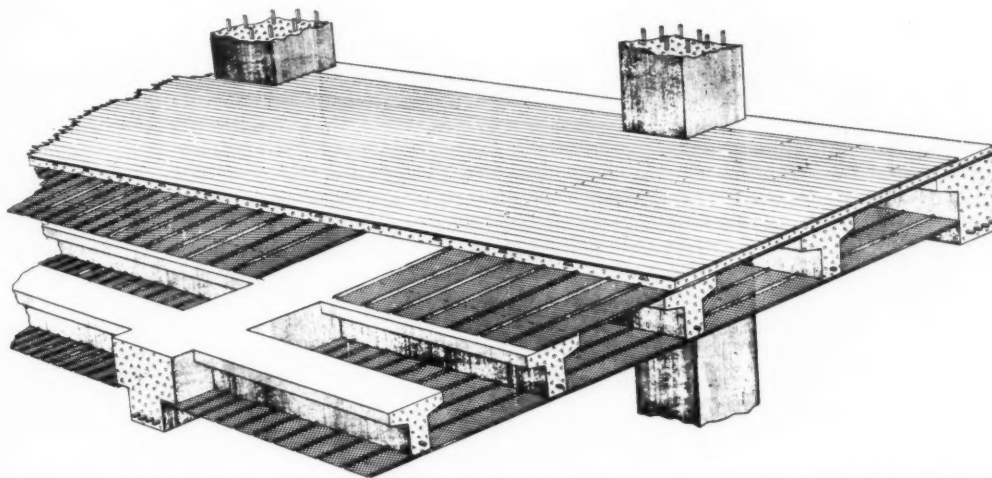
PERSPECTIVE SECTION, SHOWING T-BEAMS, INTERIOR GIRDER AND WALL GIRDER
